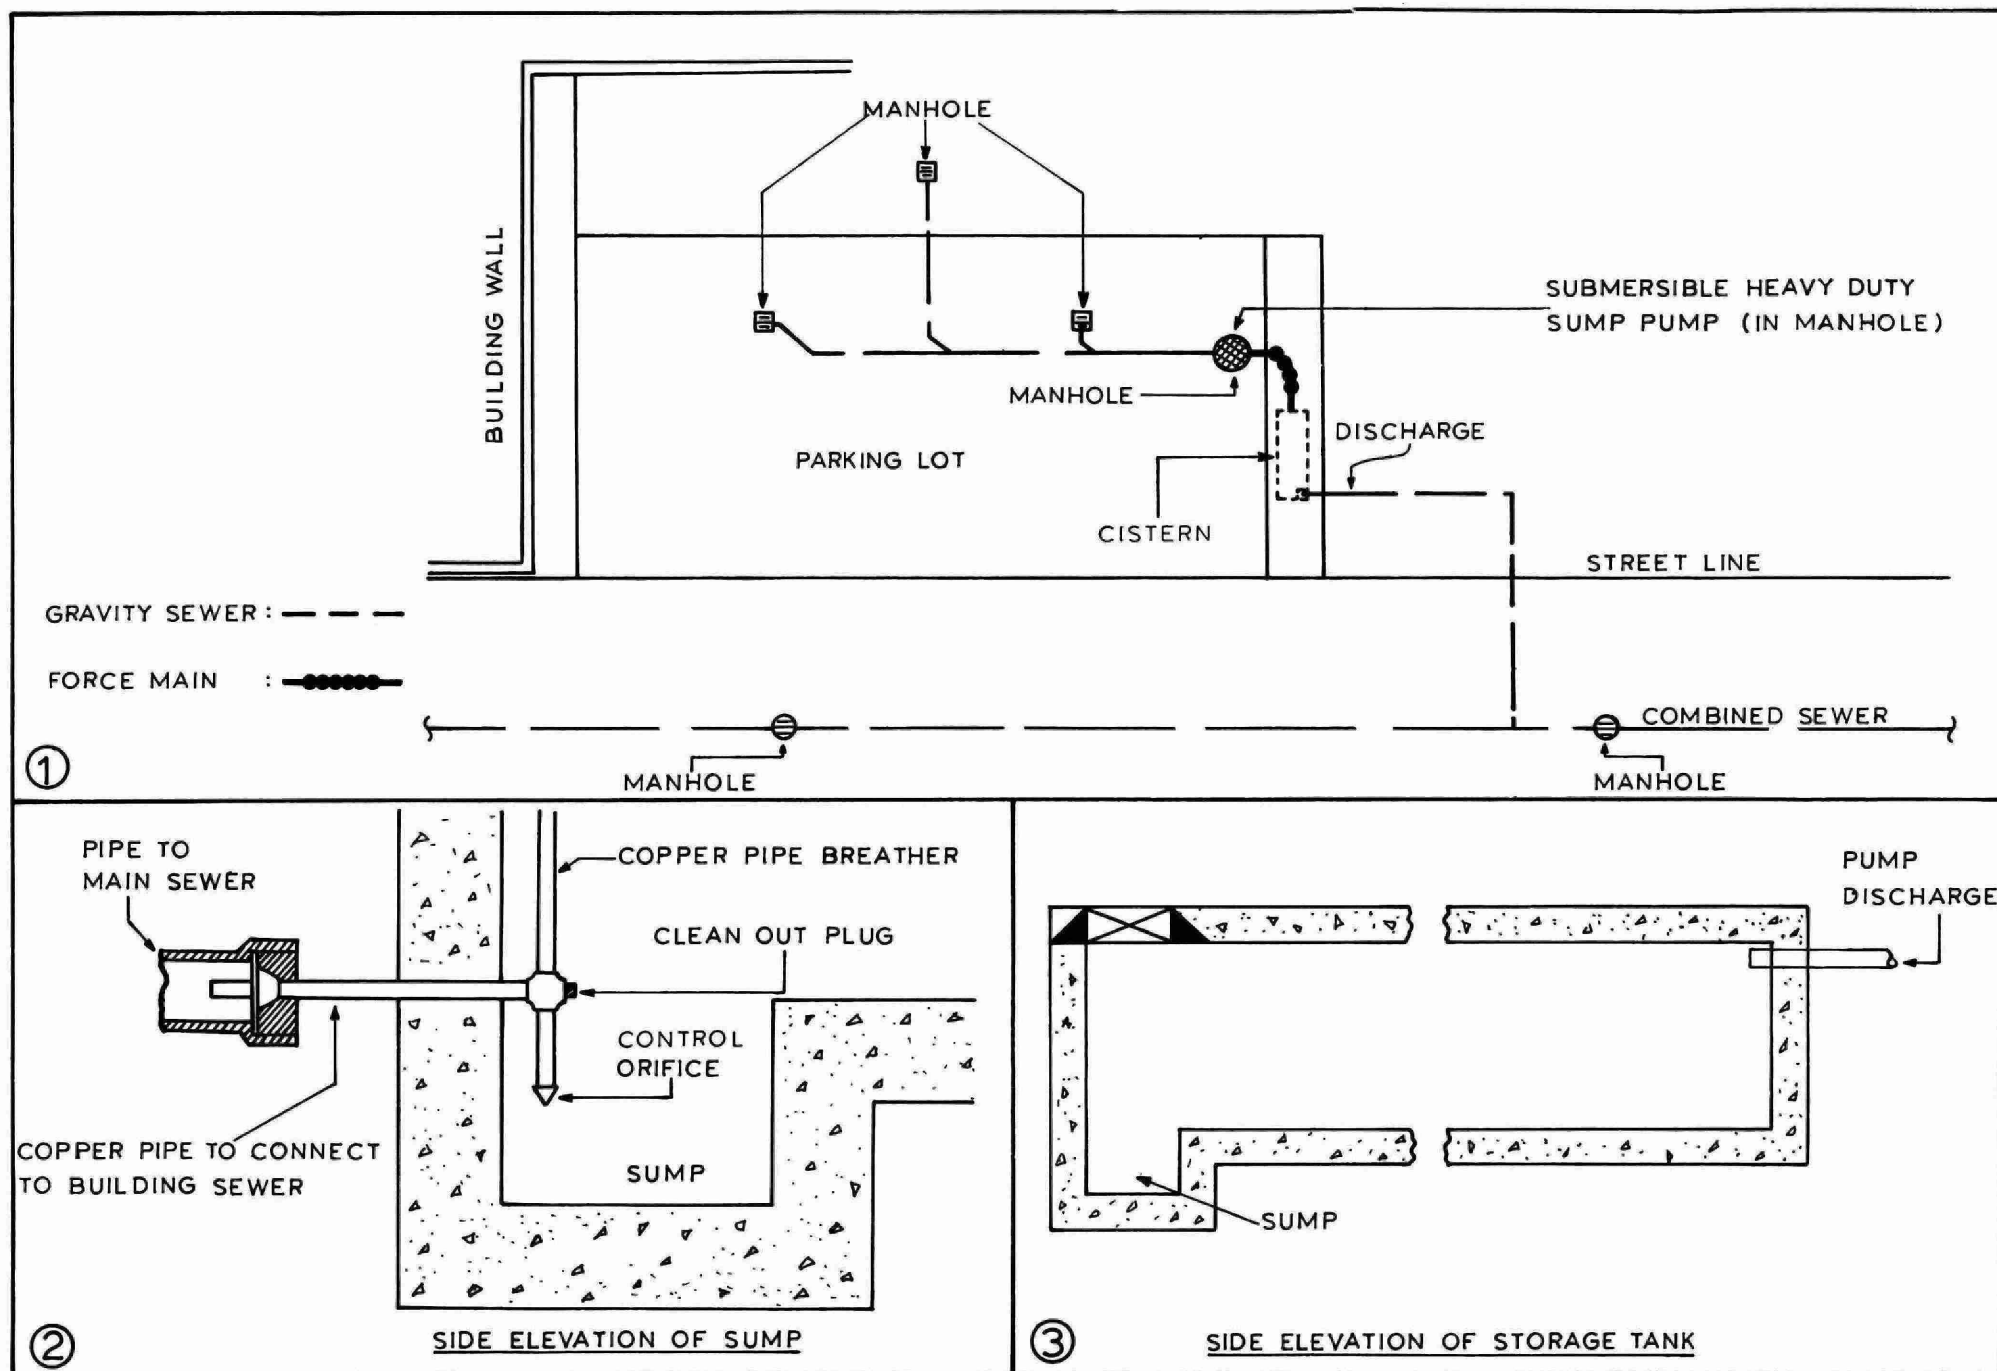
TYPICAL PARKING LOT CISTERN FOR STORM WATER STORAGE - BOROUGH OF YORK, METROPOLITAN TORONTO [29]
